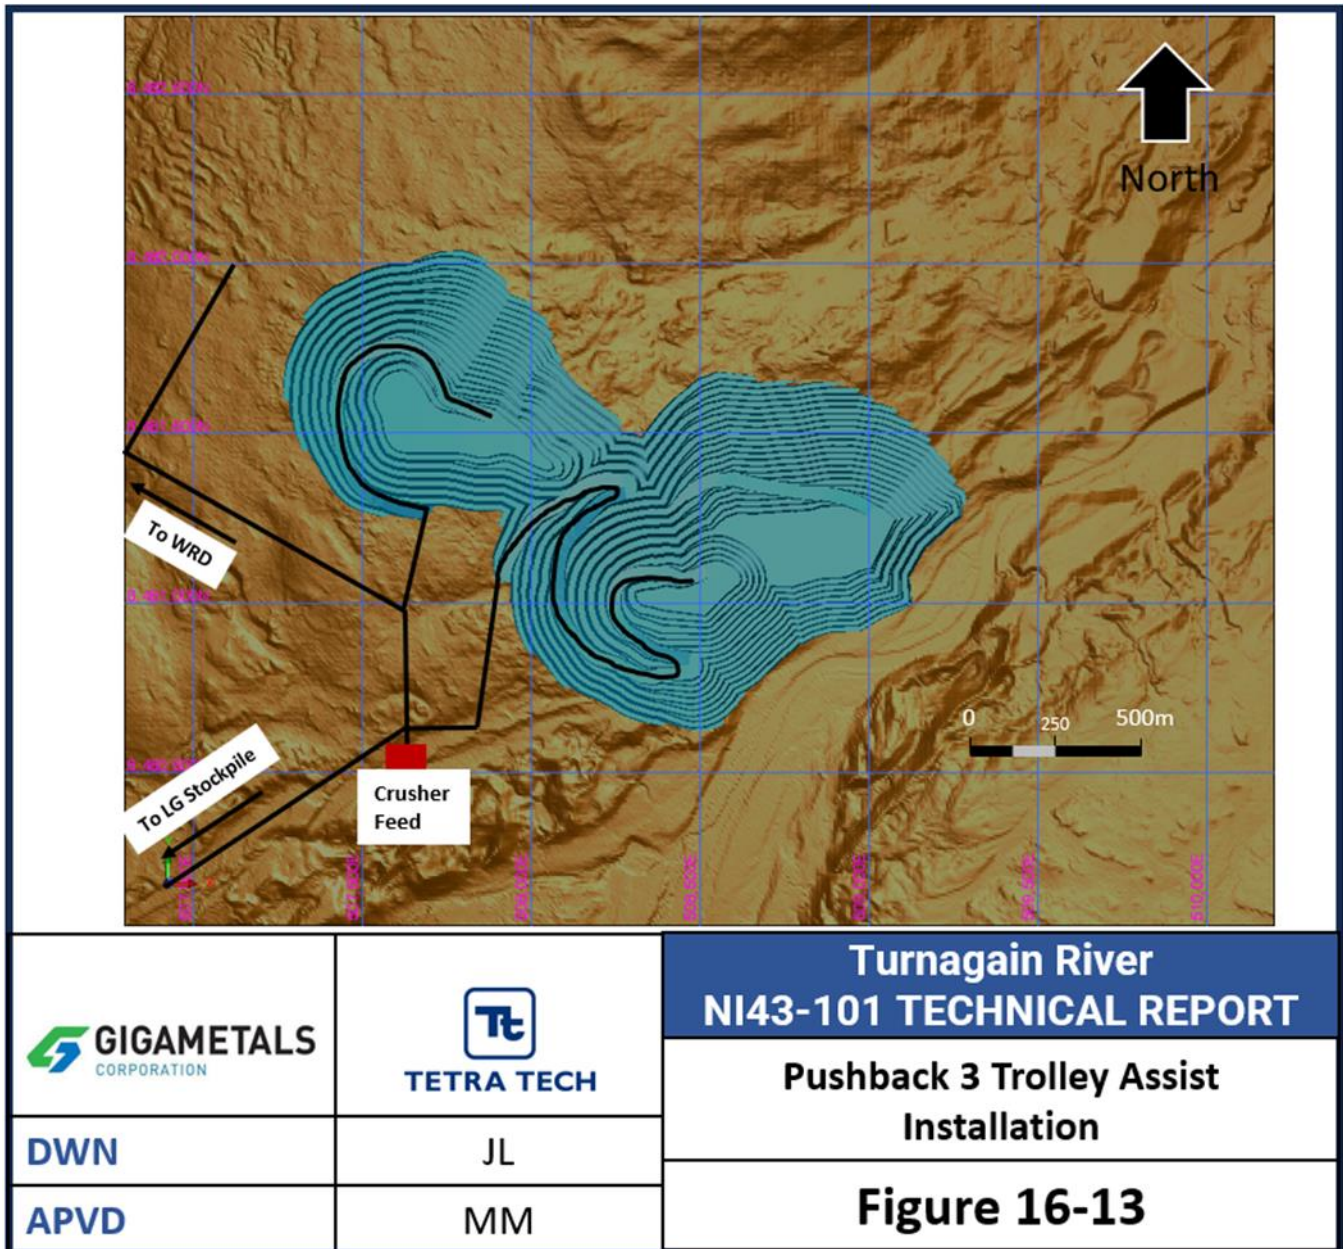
Pushback 3 Trolley-Assist Installation Plan
